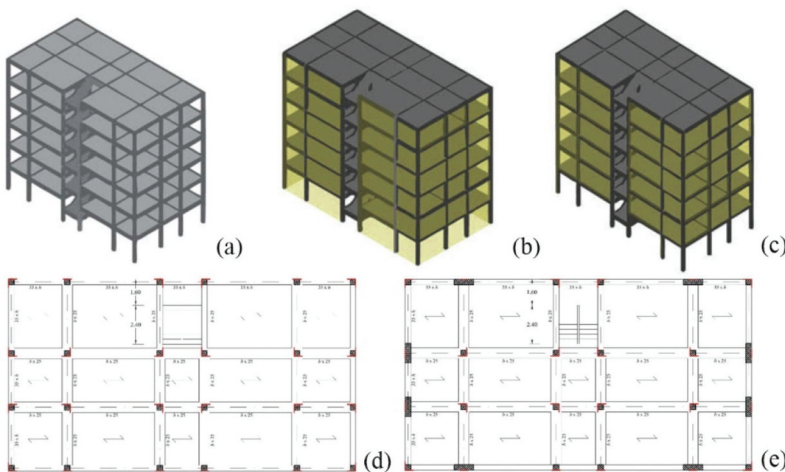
(a) six story bare-frame (BF); (b) six story infilled-frame (IF); (c) six story pilotis-frame (PF); (d) MRF building floor plan; (e) SW building floor plan.
